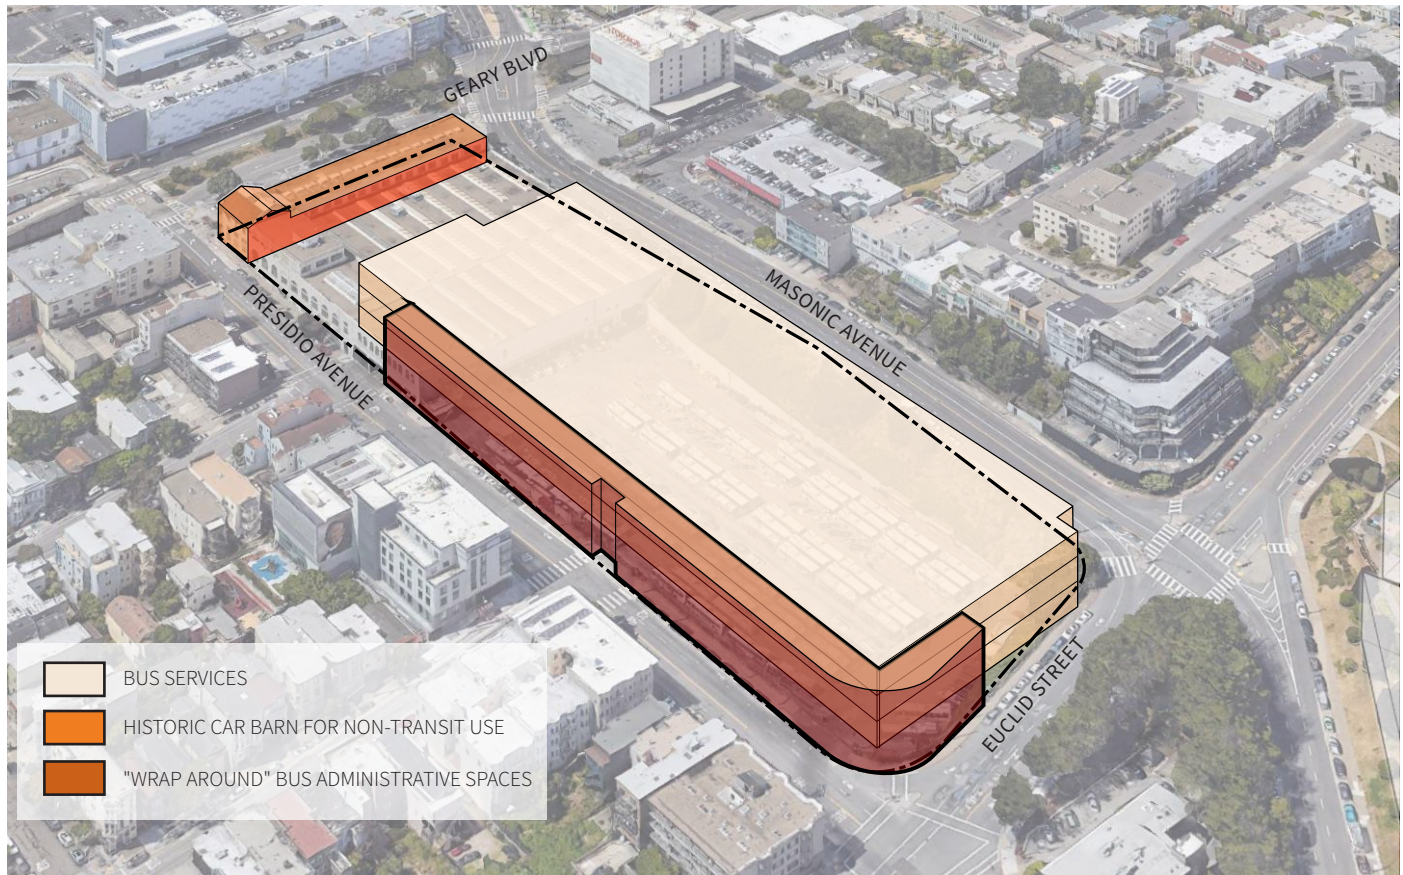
PRESIDIO YARD TRANSIT FACILITY CONCEPT
